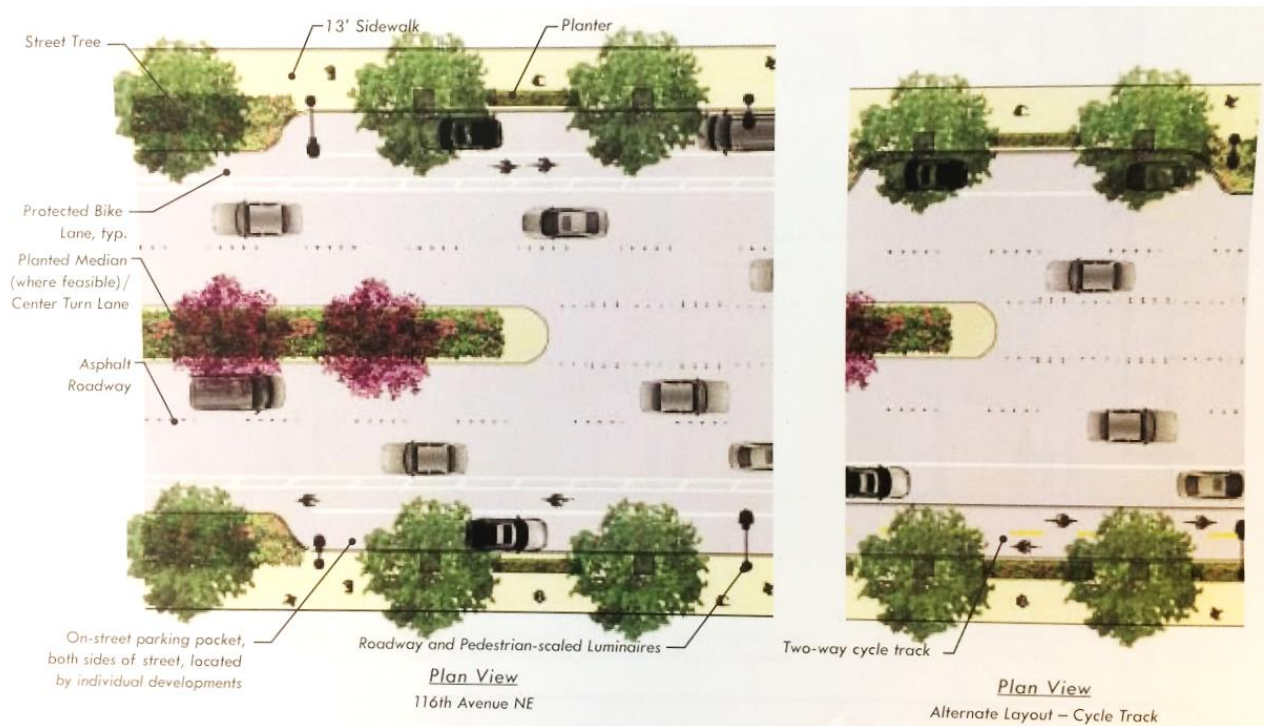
shows a conceptual plan for 116th Avenue NE that was completed by the City of Bellevue in 2015. The plan provides several different design concepts for the street and considers improvements such as wider sidewalks, additional trees and landscaping, planted medians, planters/curb extensions, on street parking, and bike lanes. For example, the sidewalks are currently 6.5 feet wide, and concepts show them being expanded to 13 feet wide (including a landscaped planter area). Obviously, such changes would mean a dramatic change for 116th Avenue.
